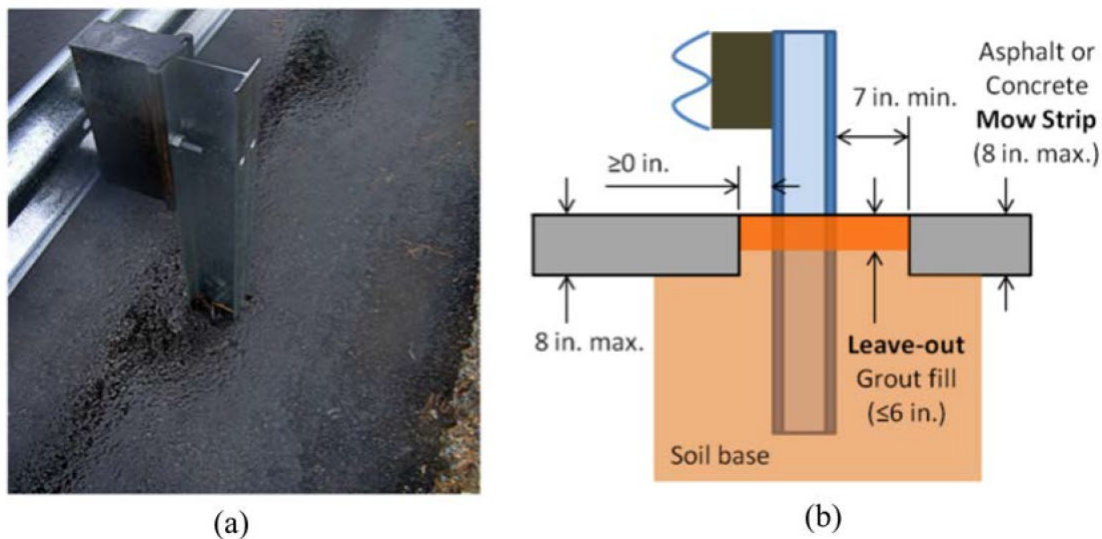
Guardrail Installations: (a) Typical Installation in Georgia; (b) Installation Incorporating Grout Leave-outs as Recommended in the *Roadside Design Guide* [3]
